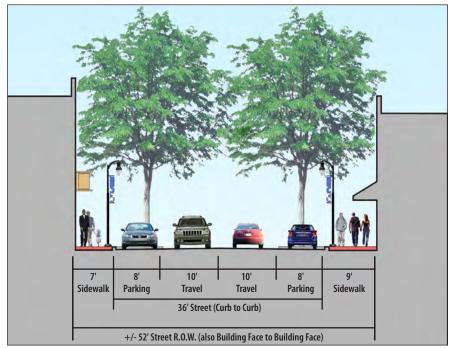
PROPOSED STREET SECTION—34TH STREET, SOUTH OF BUNKER HILL ROAD, LOOKING SOUTH.
